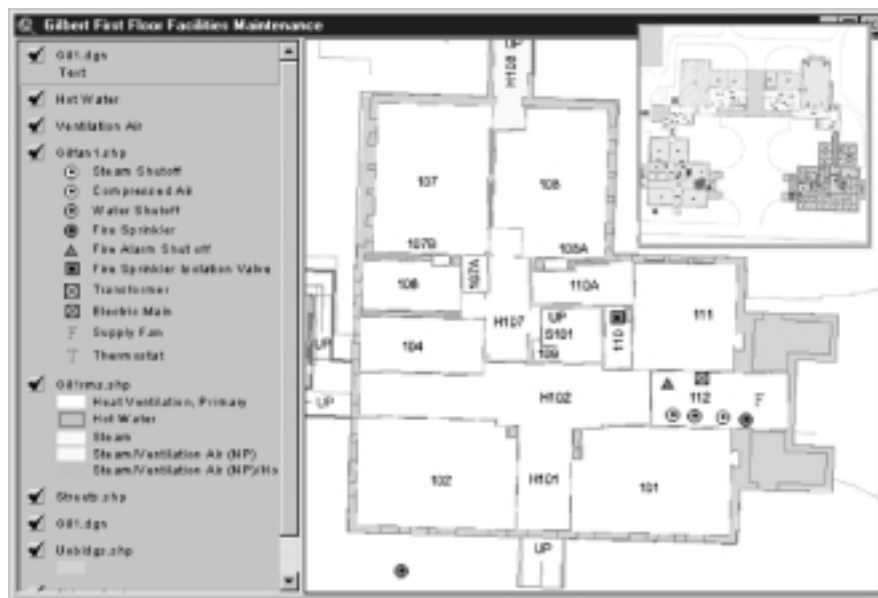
Building maintenance facilities mapping/GIS application: tracking of priority building information.
